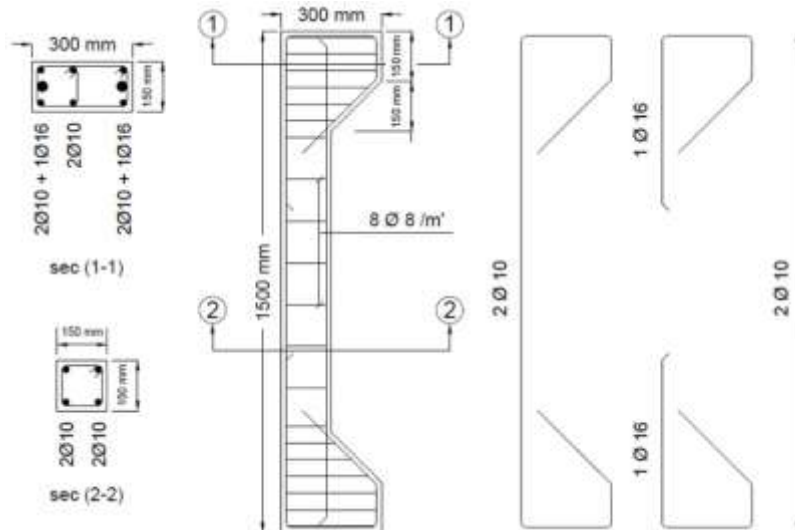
a: Layout of S1, S2, S3 and S4 showing the details of dimensions and reinforcement
